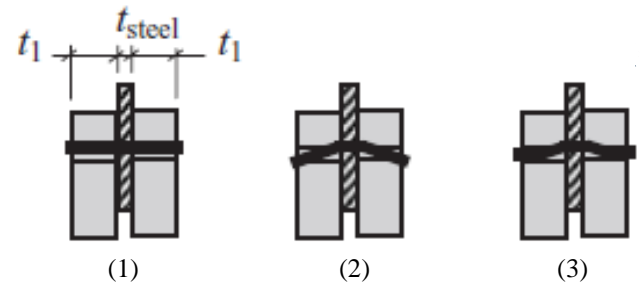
Failure modes for steel-timber connection (Porteous and Kermani [11])
